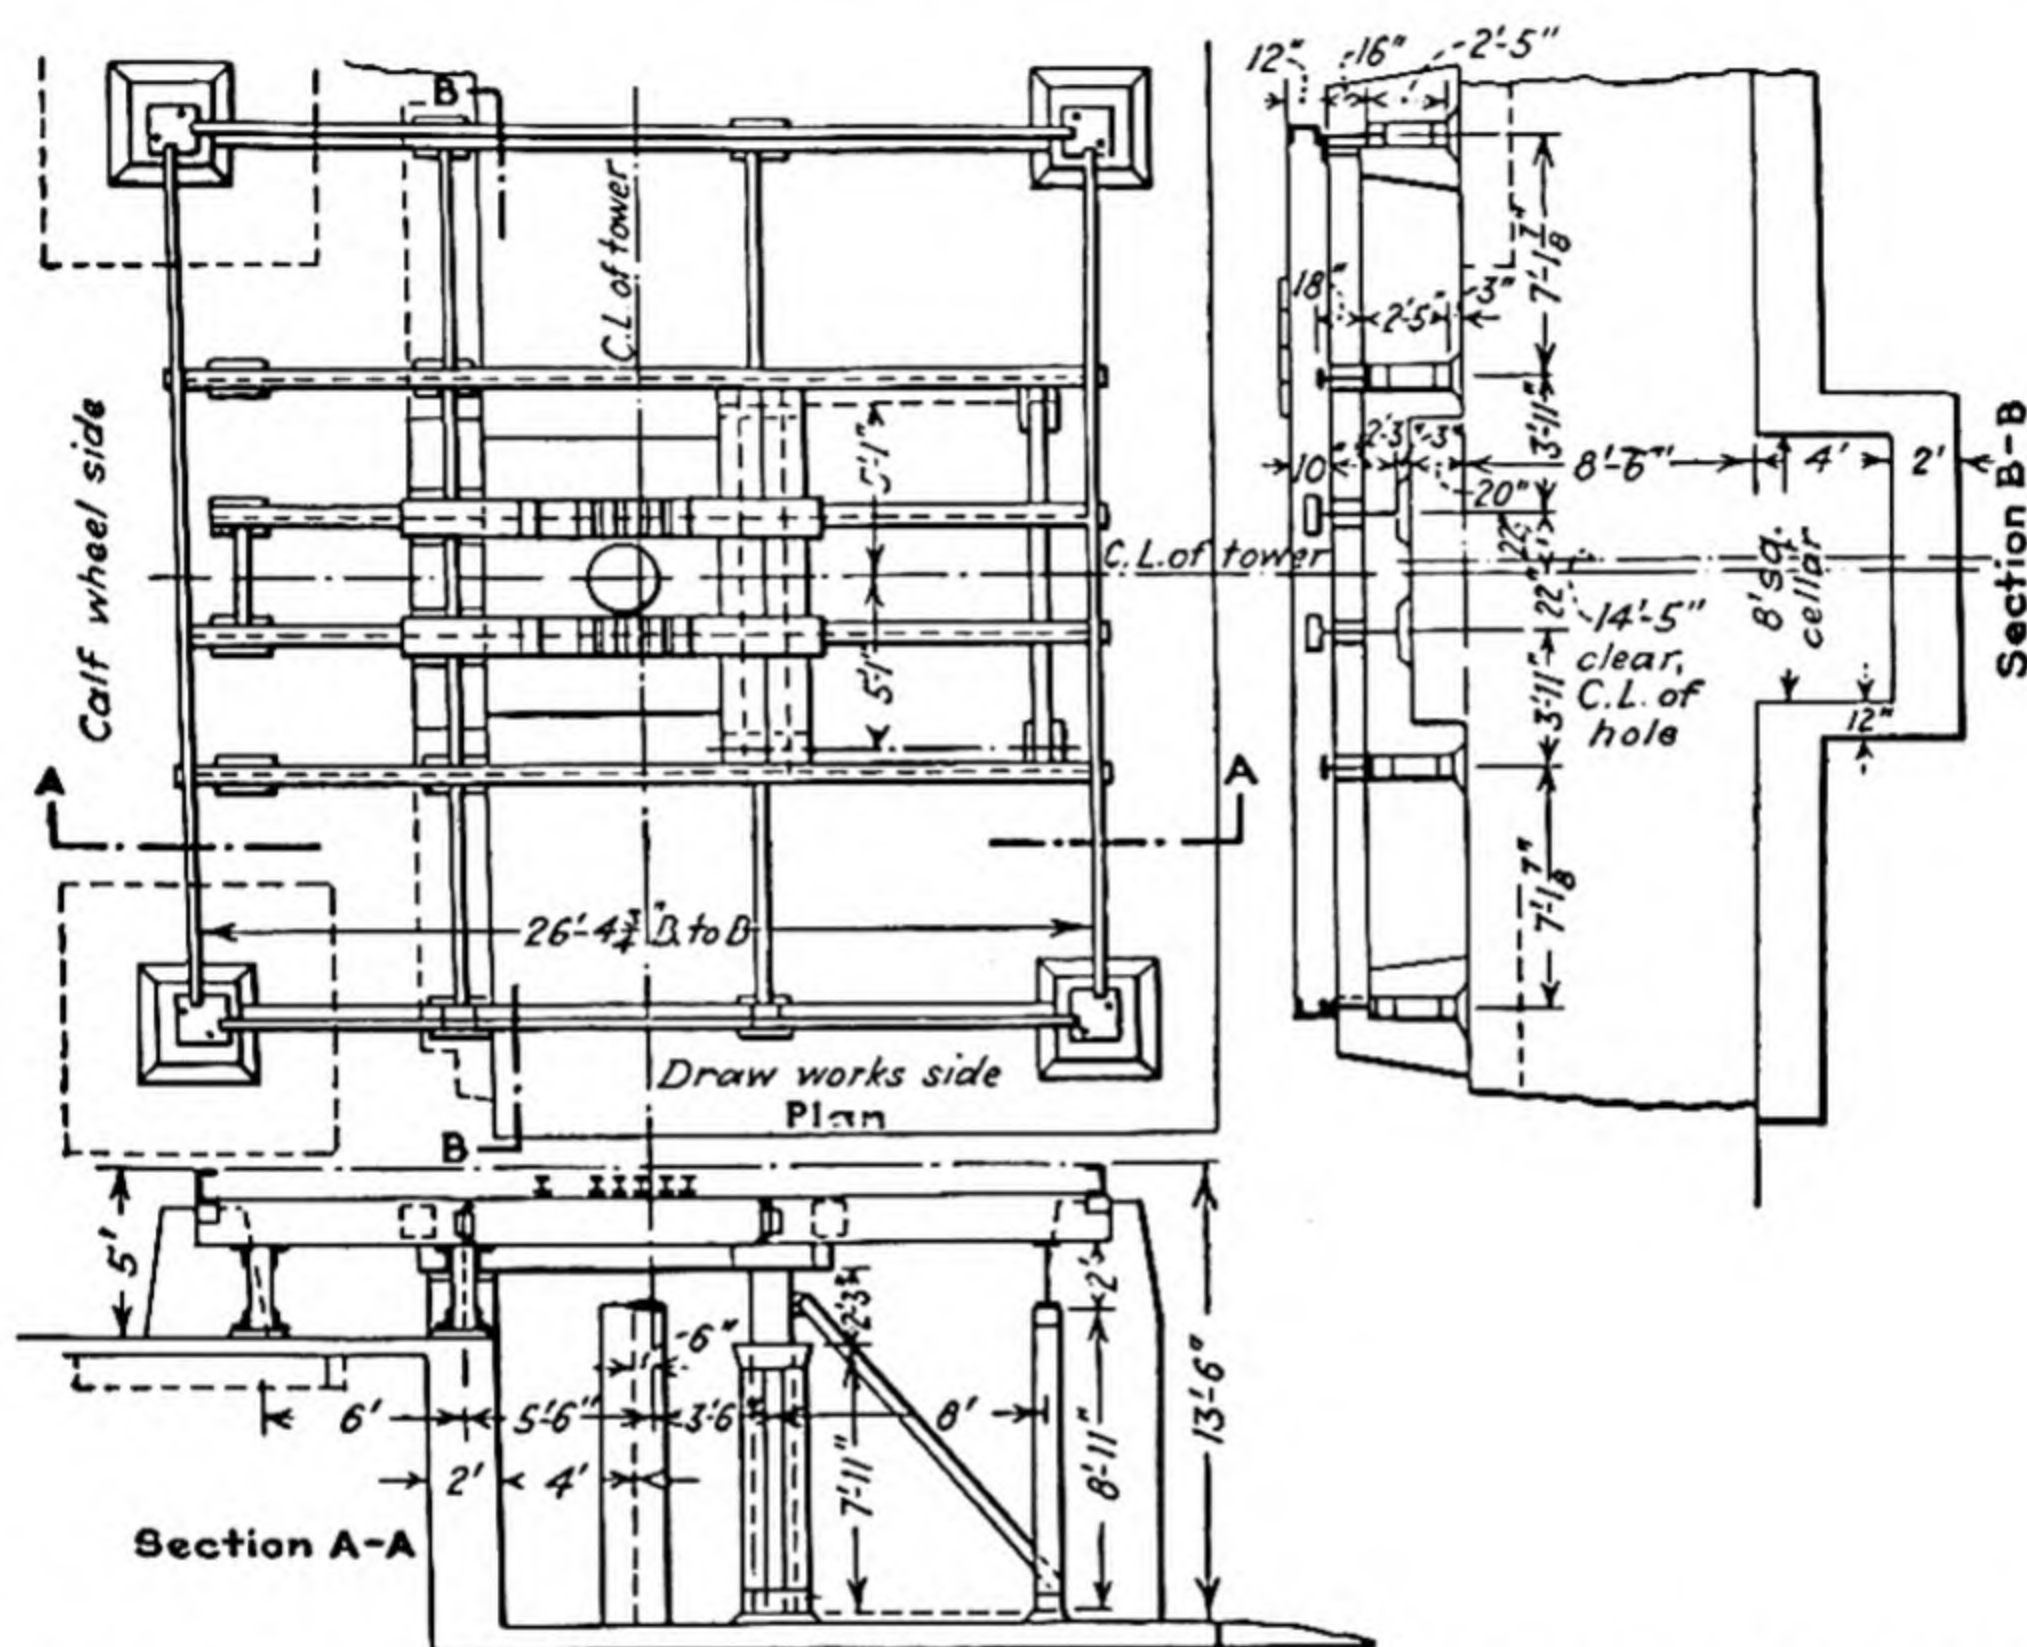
Concrete and steel foundation plan for a 122-ft. California-type combination rig.
